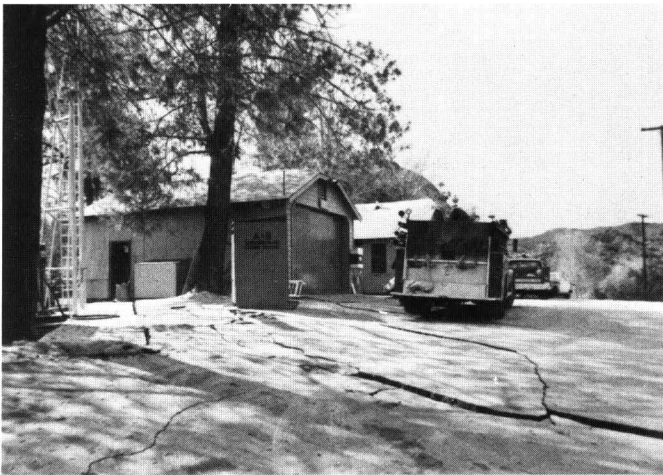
Twenty-ton fire truck, located in garage at left, was moved several feet forward, backward, and sideways, without leaving visible skid marks on floor.
